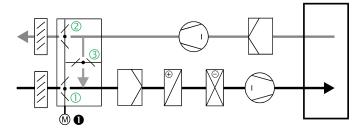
Figure B shows an air-handling system with air mixing using the SKX ..-.. /24 air mixing section ①. This section is consistently equipped with three integrated dampers from which dampers ①②, also provide inlet and outlet closing functions. The contra-rotating damper ③ is a mixing damper. If the air mixing section cannot be used, it is possible to ensure the same functions using three individual LKSX .. -../24 dampers in a similar arrangement ①②③. The dampers are controlled by the common control signal from the control unit. The contra-rotating damper ③ operation can be set by the selector on the actuator.
